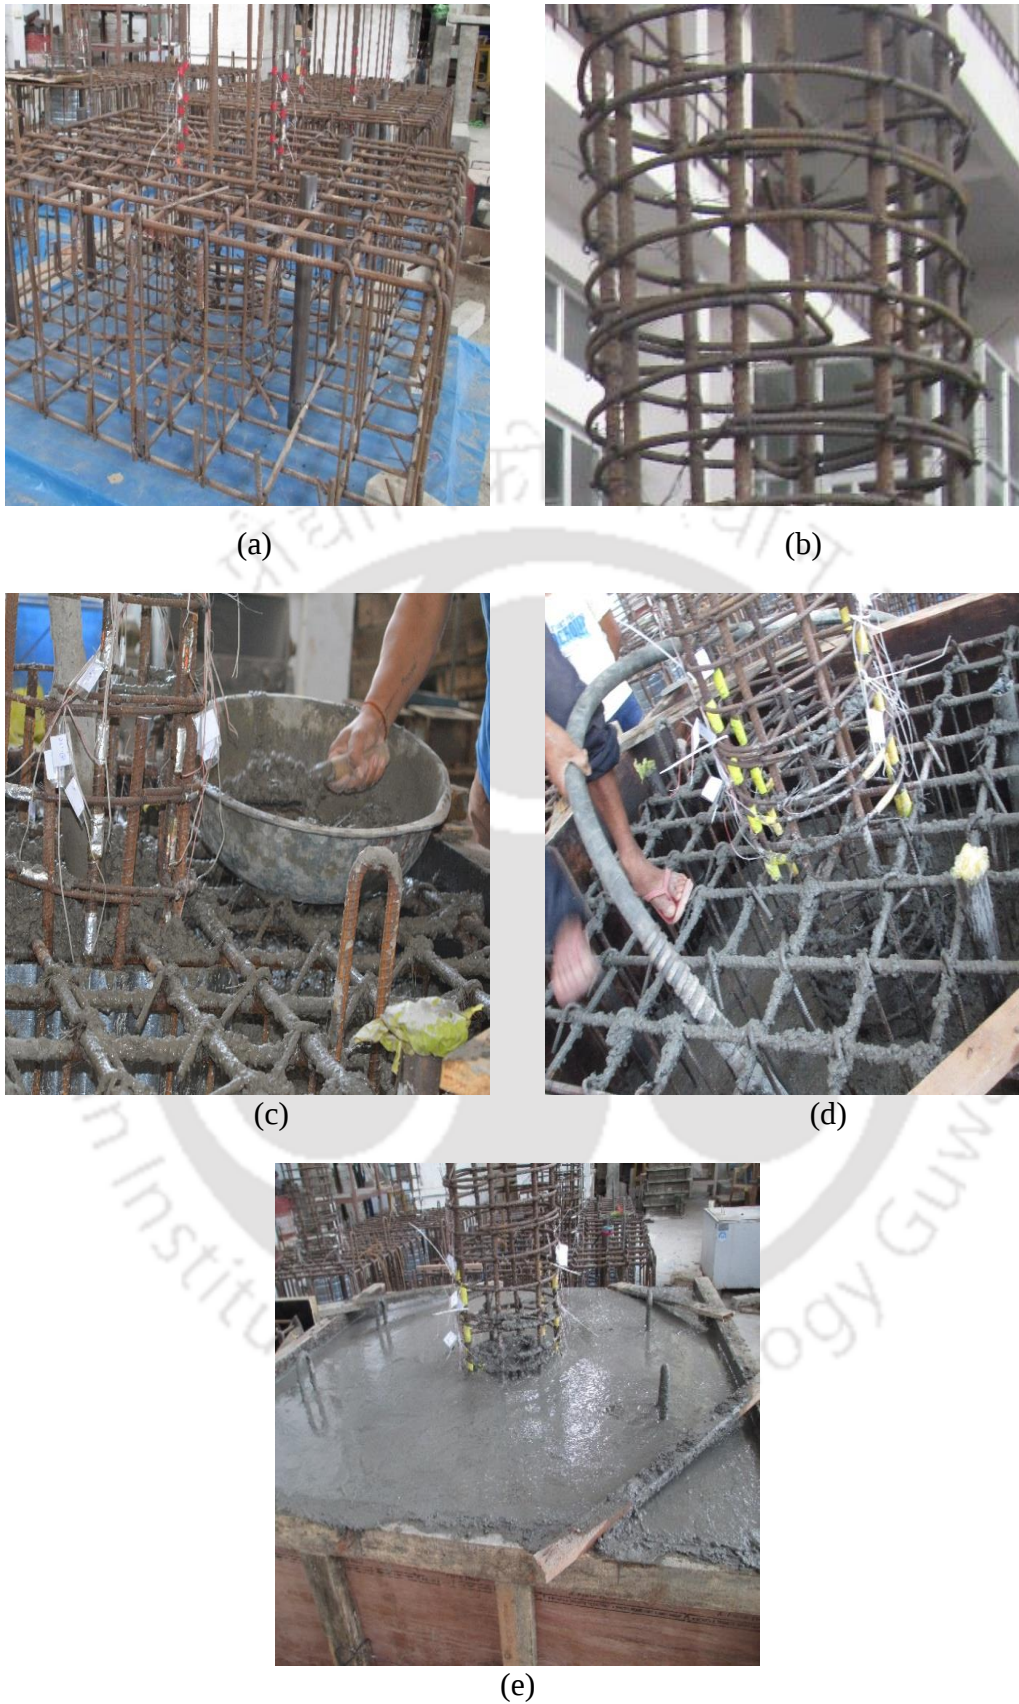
Construction phases (a) foundation and column reinforcement cage (b) close up of top of circular reinforcement cage (c) pouring of foundation concrete (d) vibration with stick vibrator (e) foundation after cast
